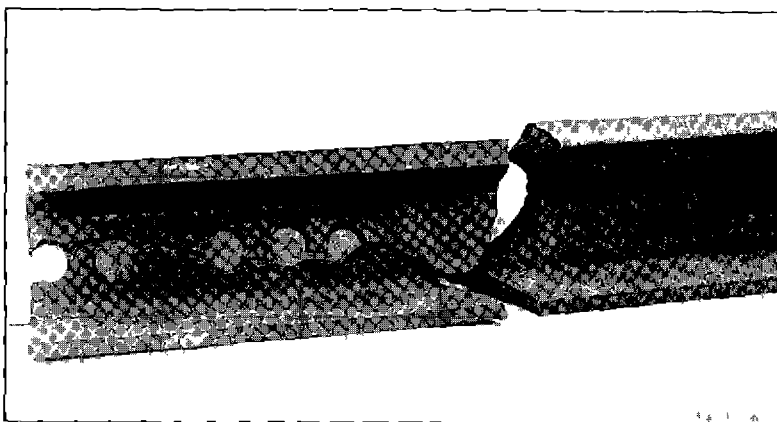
VIEW SHOWING THE END OF THE LEAD RAIL WEAKENED BY FIVE DRILLED BOLT HOLES. FRACTURE OF THE WEB ACROSS THE LINE OF BOLT HOLES THENCE TO THE BASE AND HEAD CAUSED THE DERAILMENT
